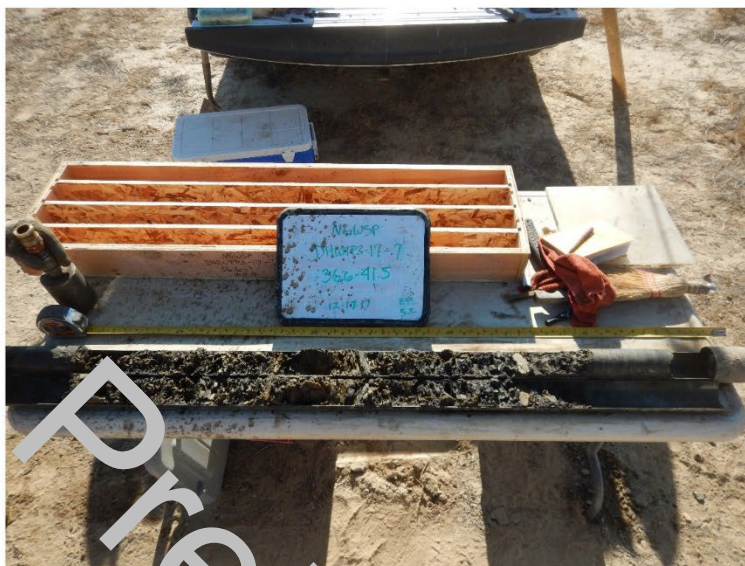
/17/2017 NGWSP, SJWTP, DHWTP3-17-7 (36.6-41.5 feet). Photo By: P. Gardner
